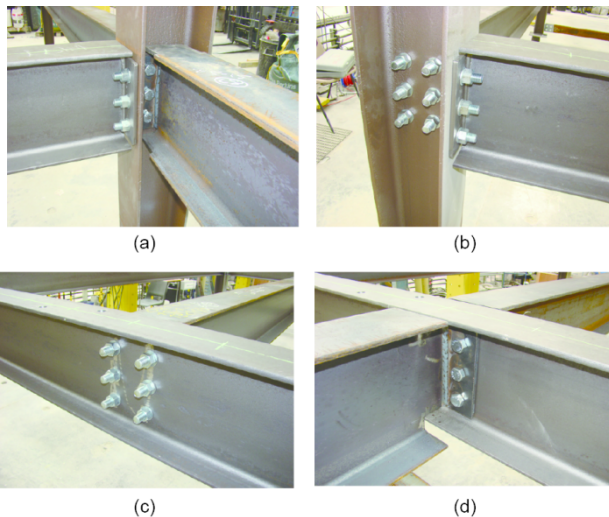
Details of beam-to-beam and beam-to-column joints. (a) Central column connections; (b) corner column connections; (c) primary edge beam connections; (d) primary central beam connections.
